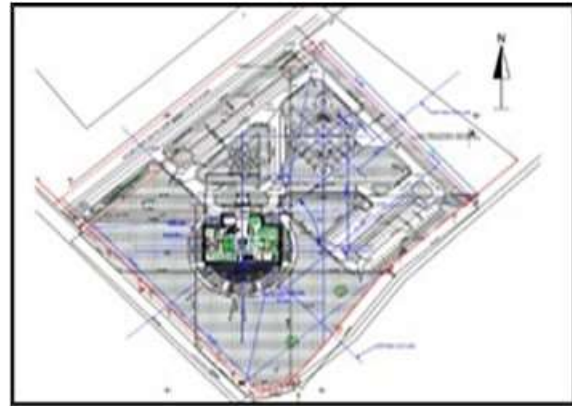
General Layout Plan of the Proposed Innovation Centre Buildings Site.
